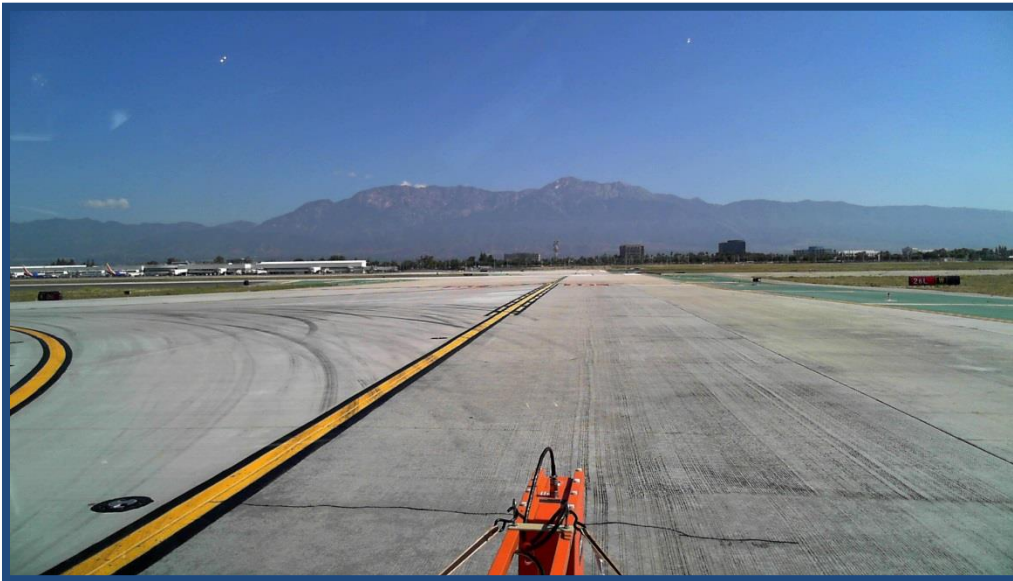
Taxiway W Representative Pavement Condition (Sta. 1+25)
